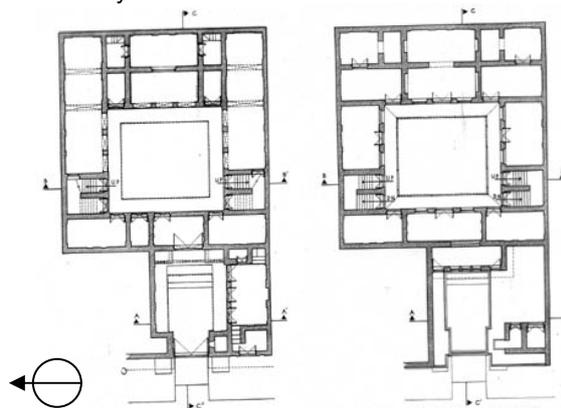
Ground Floor Plan and First Floor Plan of a Small Haveli, Dundlod, Shekhawati, Rajasthan
